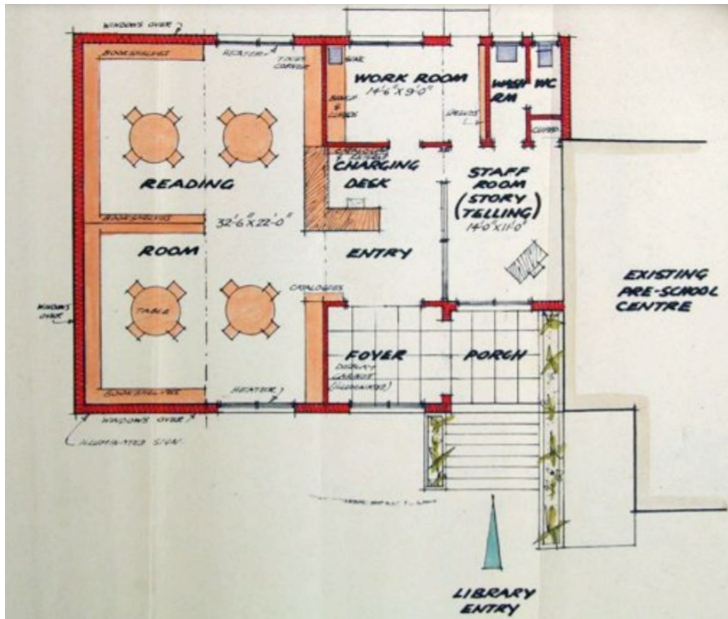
Sketch plan for the Children's Library prepared by local architectural designer David L Woodger in June 1960, showing existing pre-school building to the right. (Source: Public Building Plans File No.5841 Plan No.4057, Unit 413, VRPS 8044, PROV, cited in Mills and Westbrooke 2010: 15)
